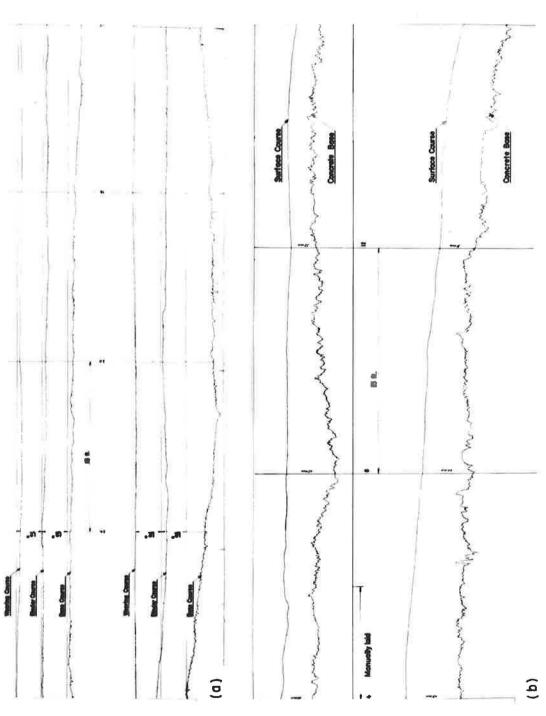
Evenness diagram made with Planum instrument: (a) typical pattern of highway N 1, Grauholz; (b) resurfacingon cement concrete of a bridgway.
